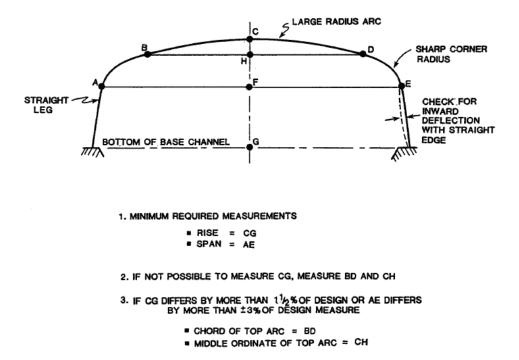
(Exhibit 91) Shape Inspection Structural Plate Box Culverts
